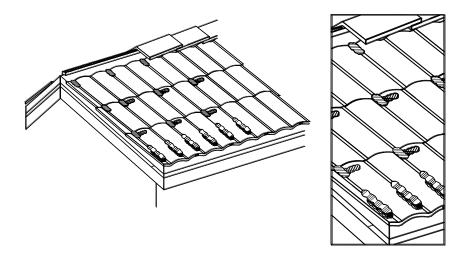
Placement Detail "B" Medium Profile Roofing Tile
